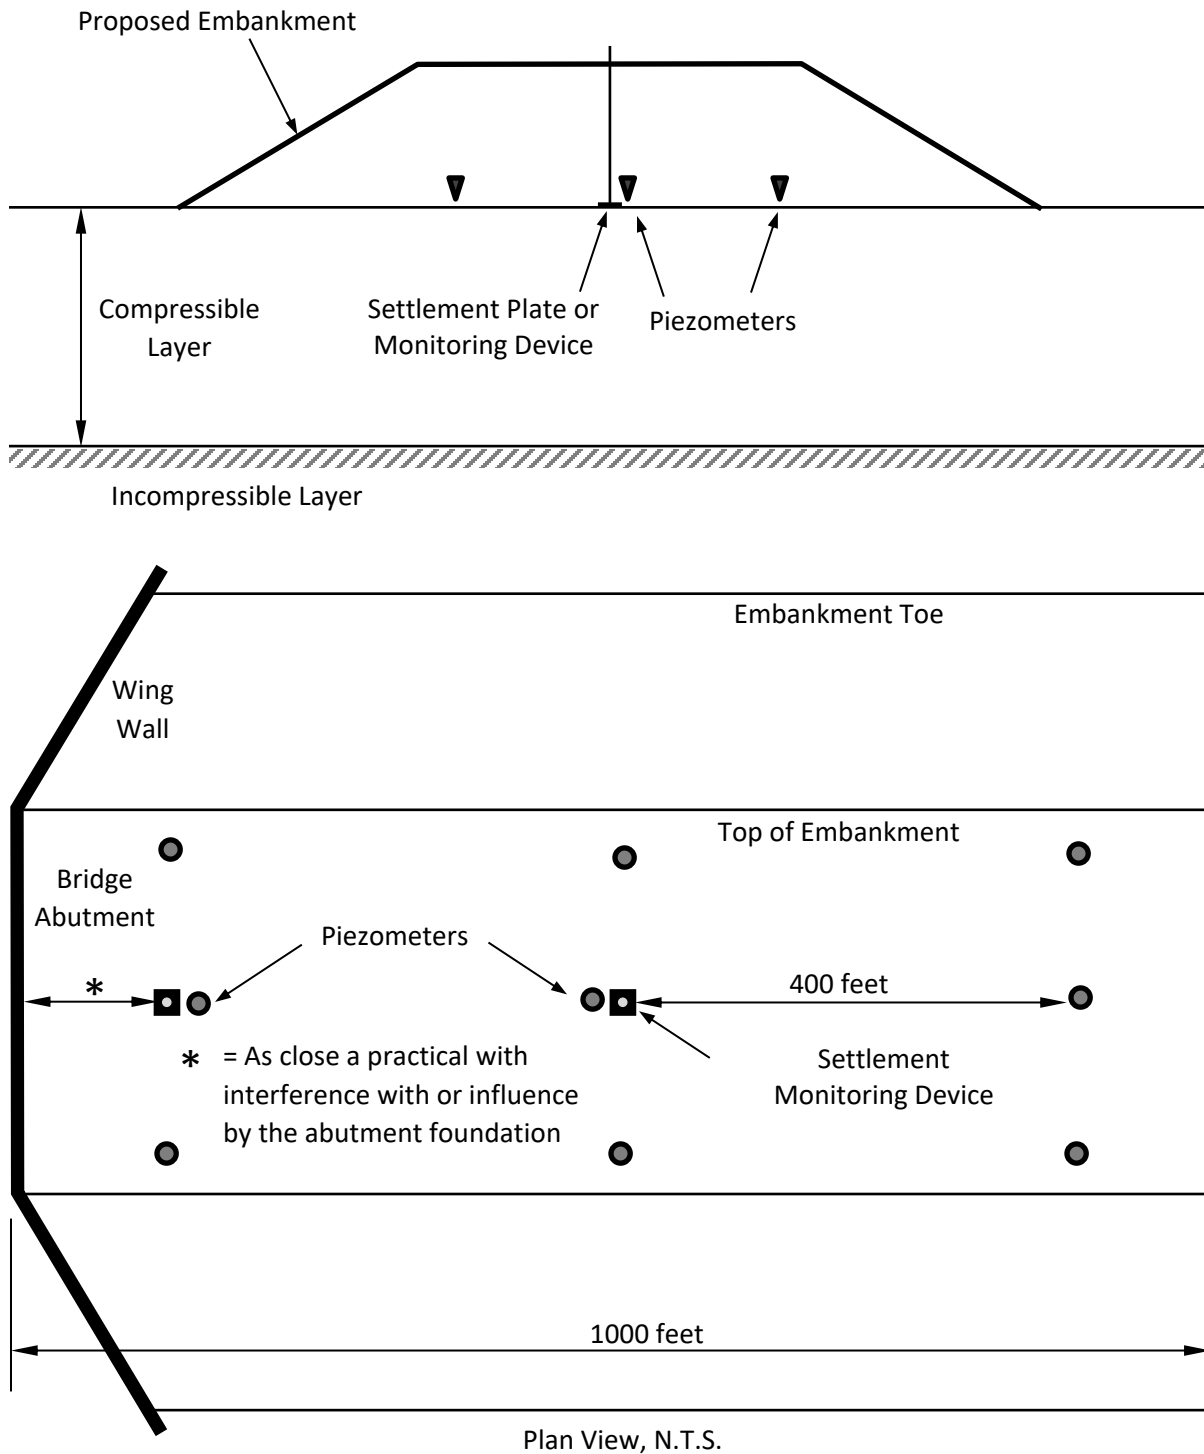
Example Piezometer Layout for Embankment and Structure with Supplemental Settlement Monitoring Devices
